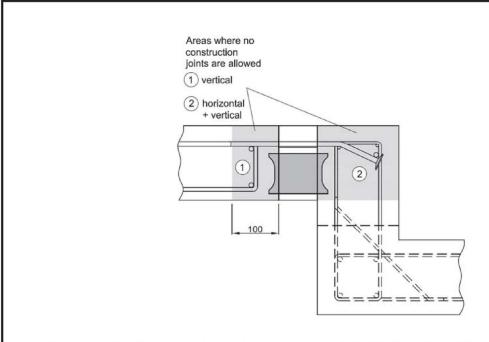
Reinforcement layout for height offset HIT-HP/SP MVX _OU
